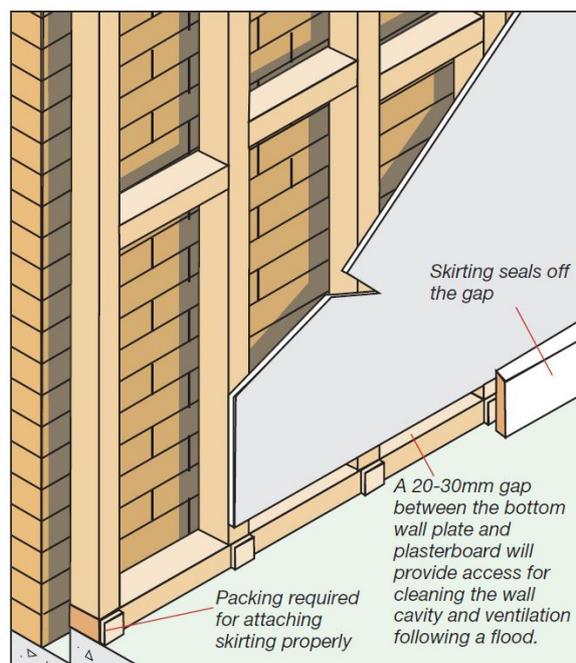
Recommend substituting plasterboard for fibre cement sheeting. Leave a gap at the base of fibre cement sheeting for drainage and ventilation. (H-N FMSC 2006a)
